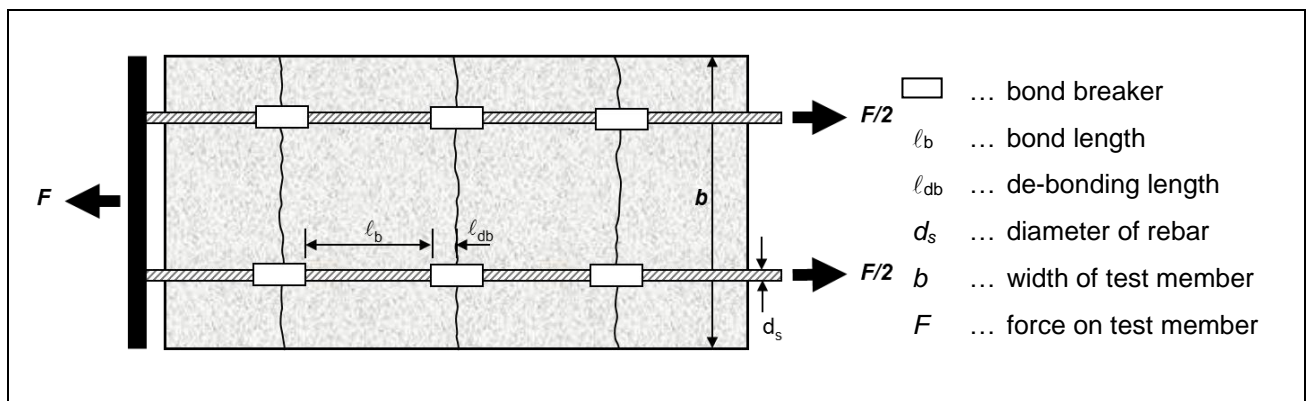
Example for test member with bond breaking pipes on rebar (plan view)
